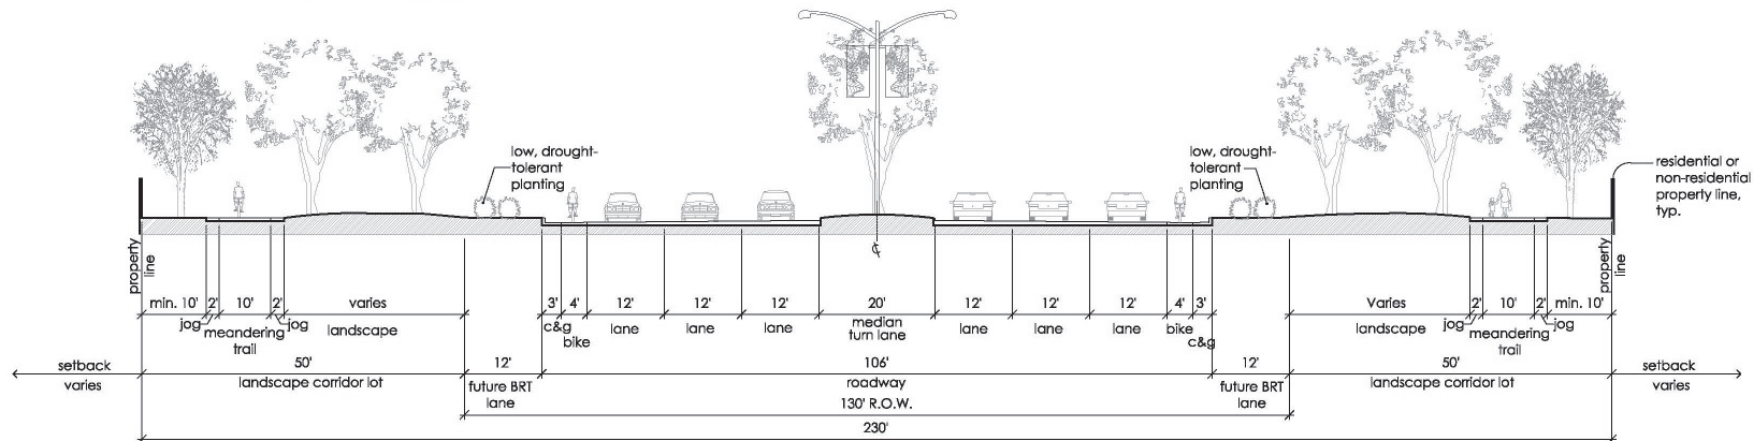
Roadway Sections – Thoroughfare (Watt Avenue Phase 1 and 2)
